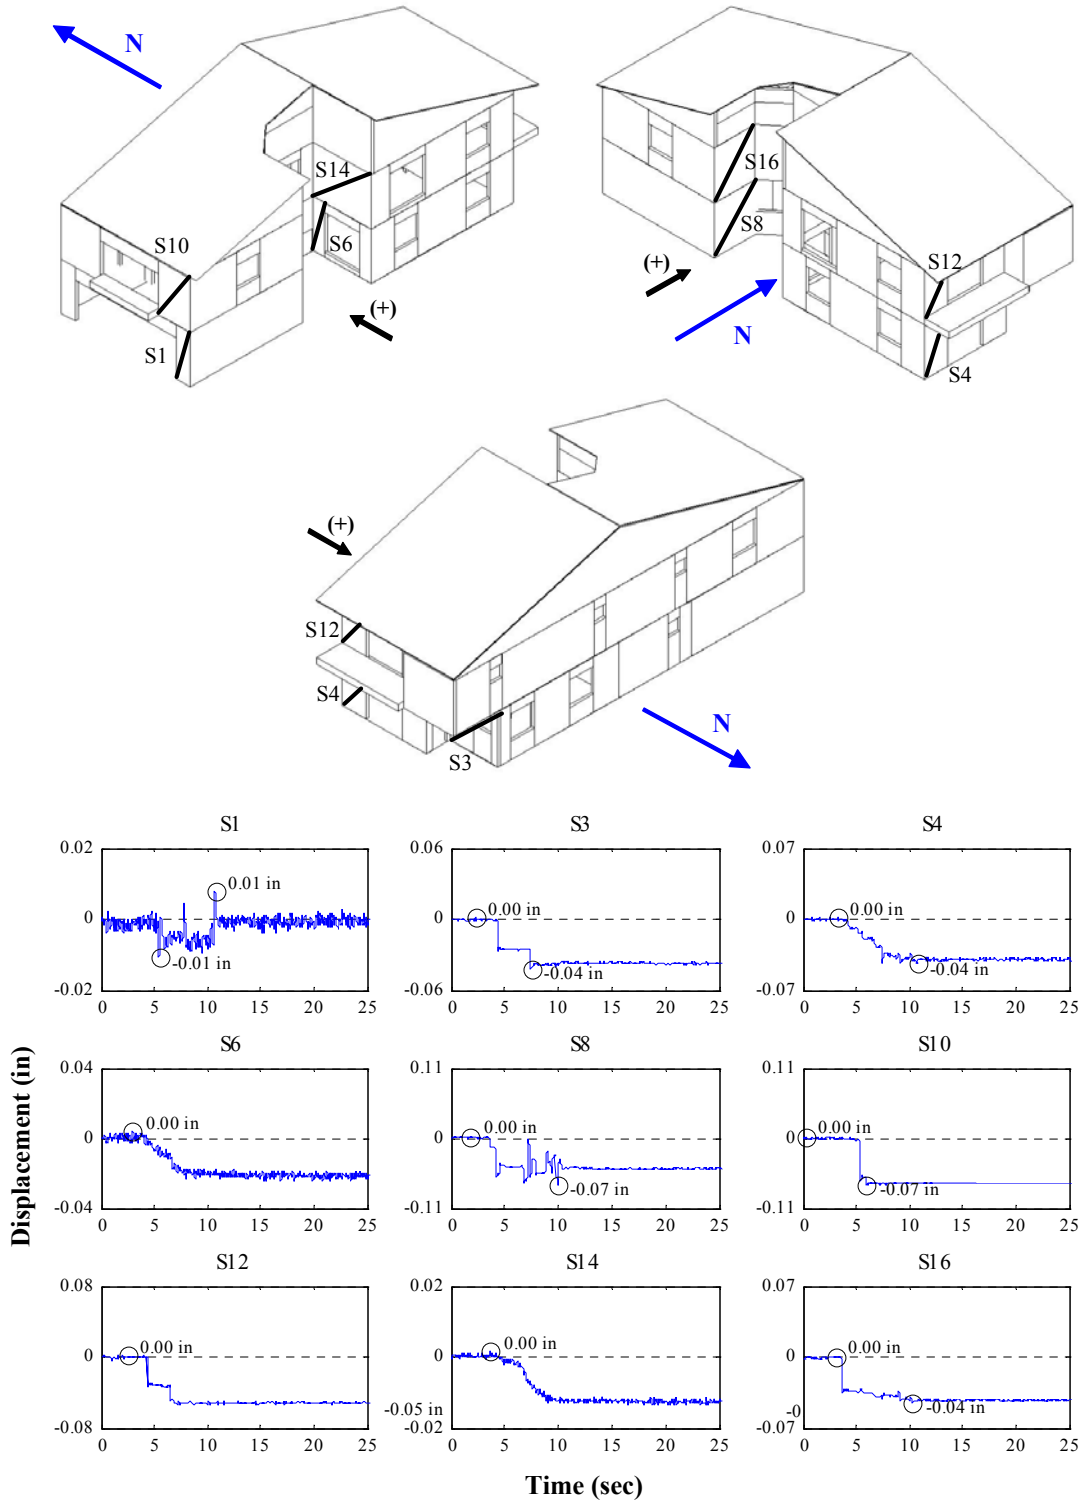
Wall deformations of north-south external walls for Test NWP2S03
